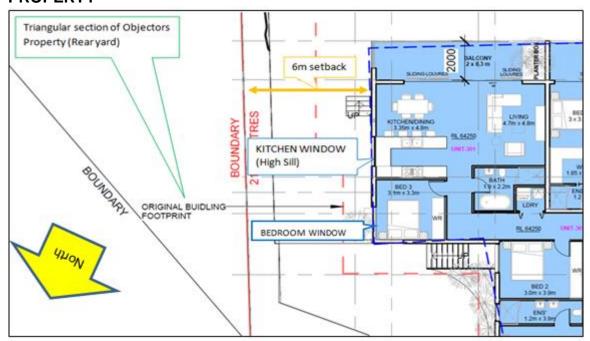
PHOTO SHOWING POSITION OF WINDOWS AND ADJOINING PROPERTY
